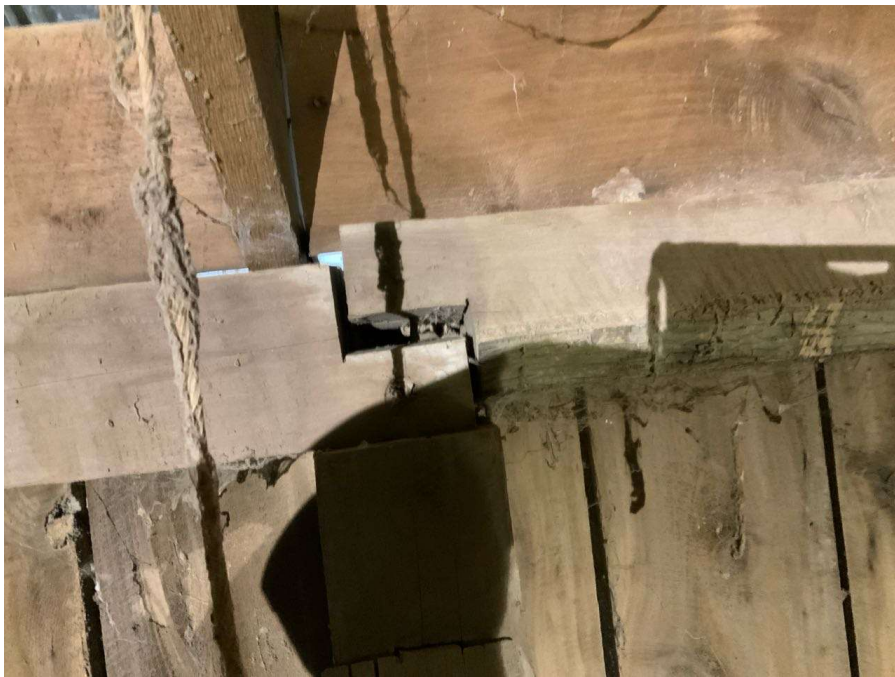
Perimeter roof beam between Column C/4 and D/4 is twisting 9 degrees south at east bearing and has minimal to no bearing remaining.
